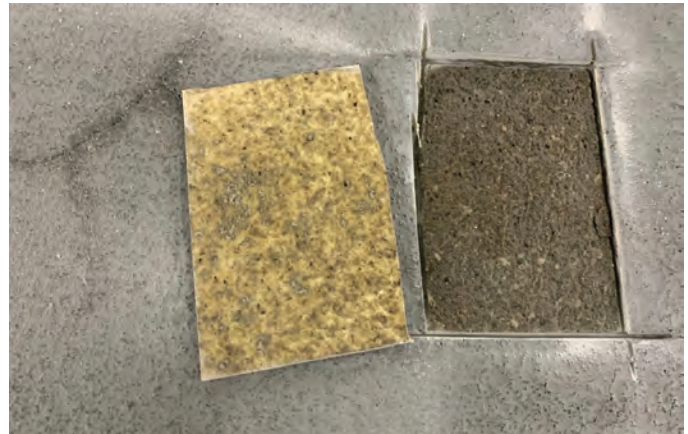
White powdery substance exhibited on underside of debonded waterproof membrane due to chloride contamination
